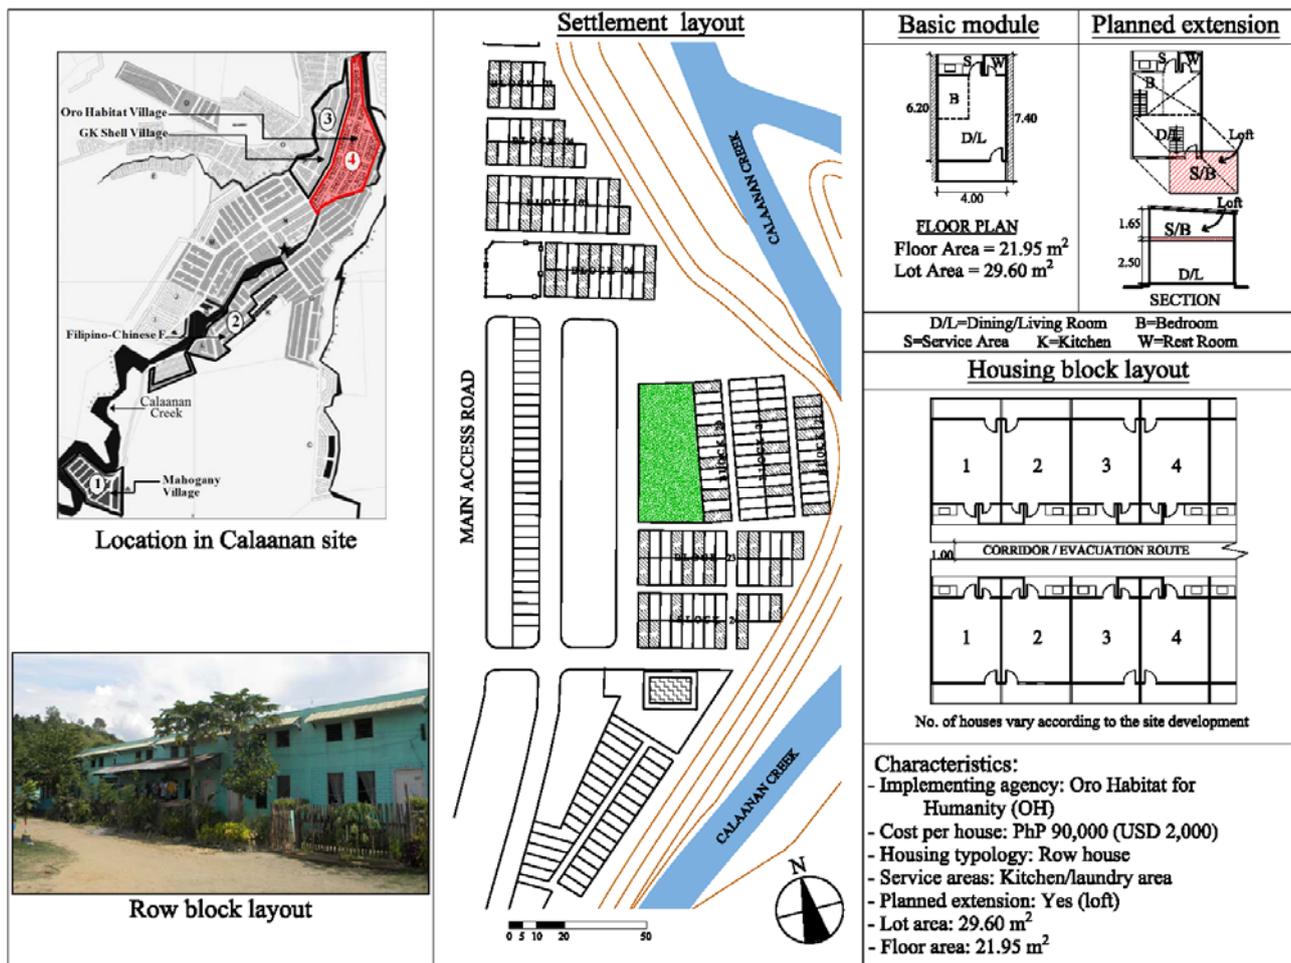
Oro Habitat Village, settlement layout and housing design
